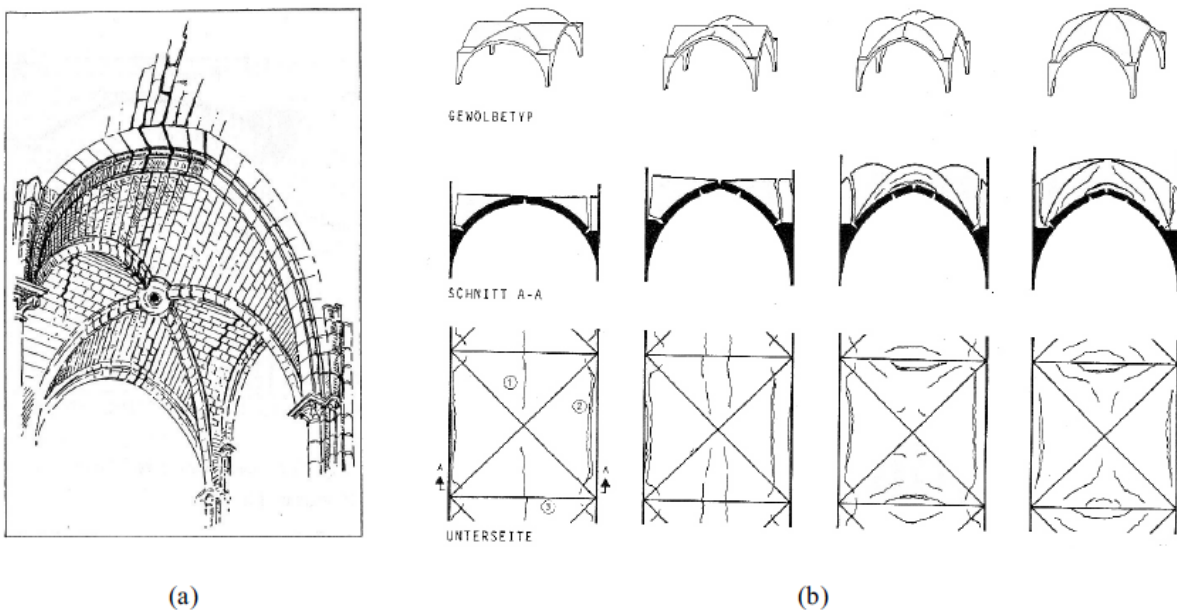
Typical crack patterns for masonry vaults. (a) Cracks running parallel with the side walls (Sabouret's cracks). (b) Typical pathologies for some common vaults (Roca 2014).
